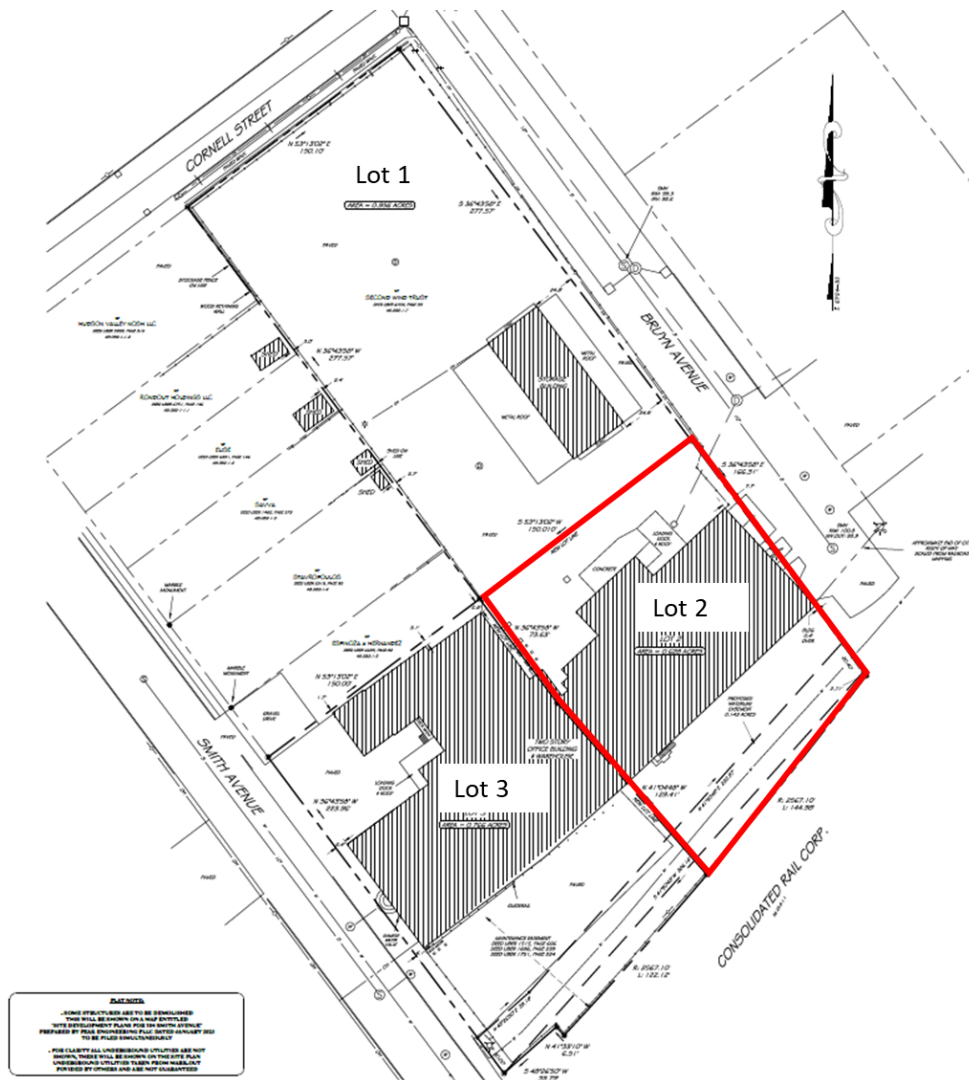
Figure B: Subdivision Plat Plan, detail. Site boundary is outlined in red.
